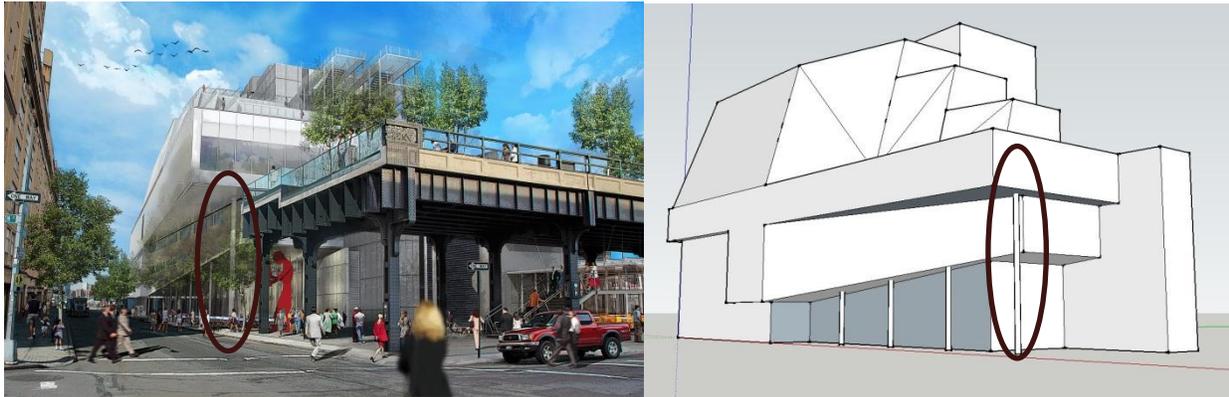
Rendering and Sketchup model showing column 3-M.5 from SE corner
